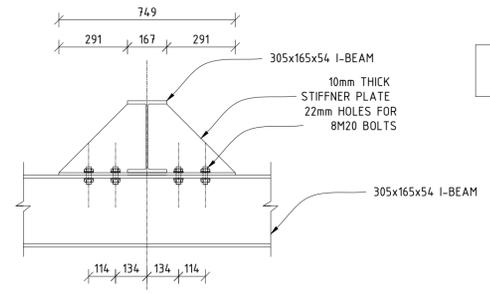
SECTION THROUGH I-BEAM CONNECTION
